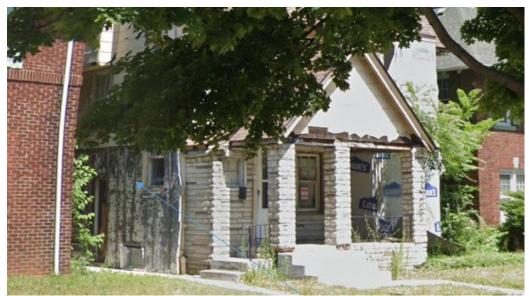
by owner. Note area where aluminum siding has fallen off, revealing synthetic shingle siding underneath.
